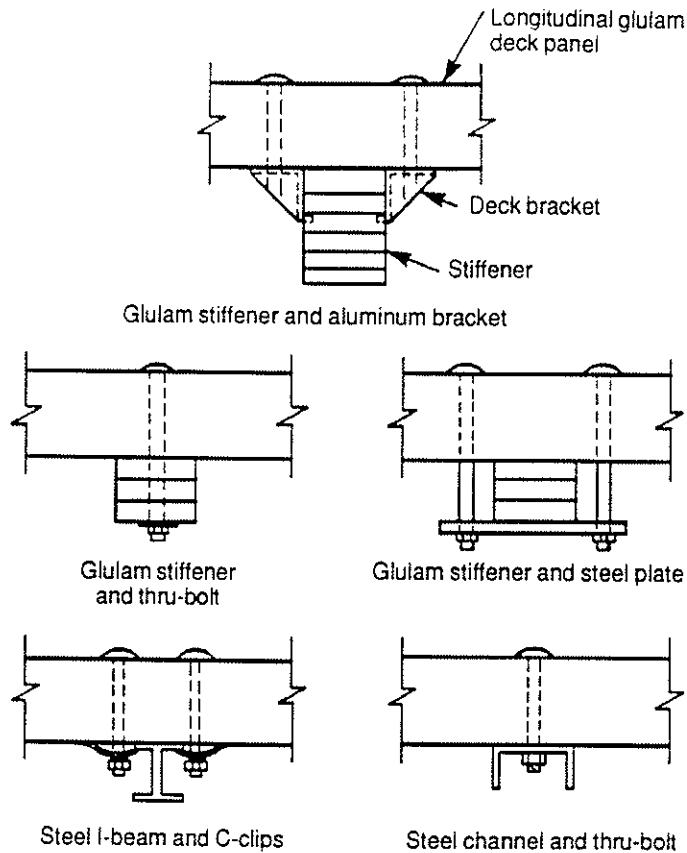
Attachment of Stiffener Beams to Longitudinal Glulam Decks
